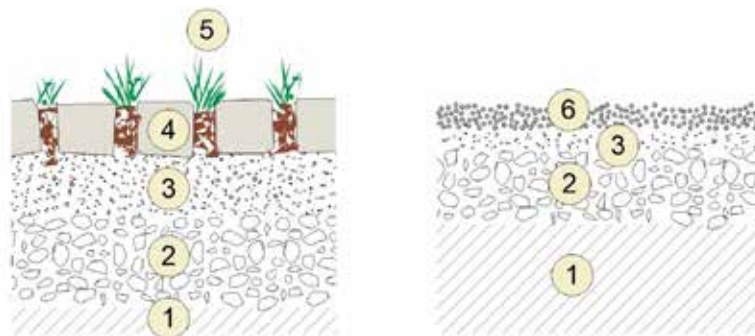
Sketch of two types of water permeable paving and sub construction: 1 grown soil, 2 crushed rocks, 3 crushed stones, sand 4 cobblestone 5 widened joints, filled with substrate, 6 gravel
